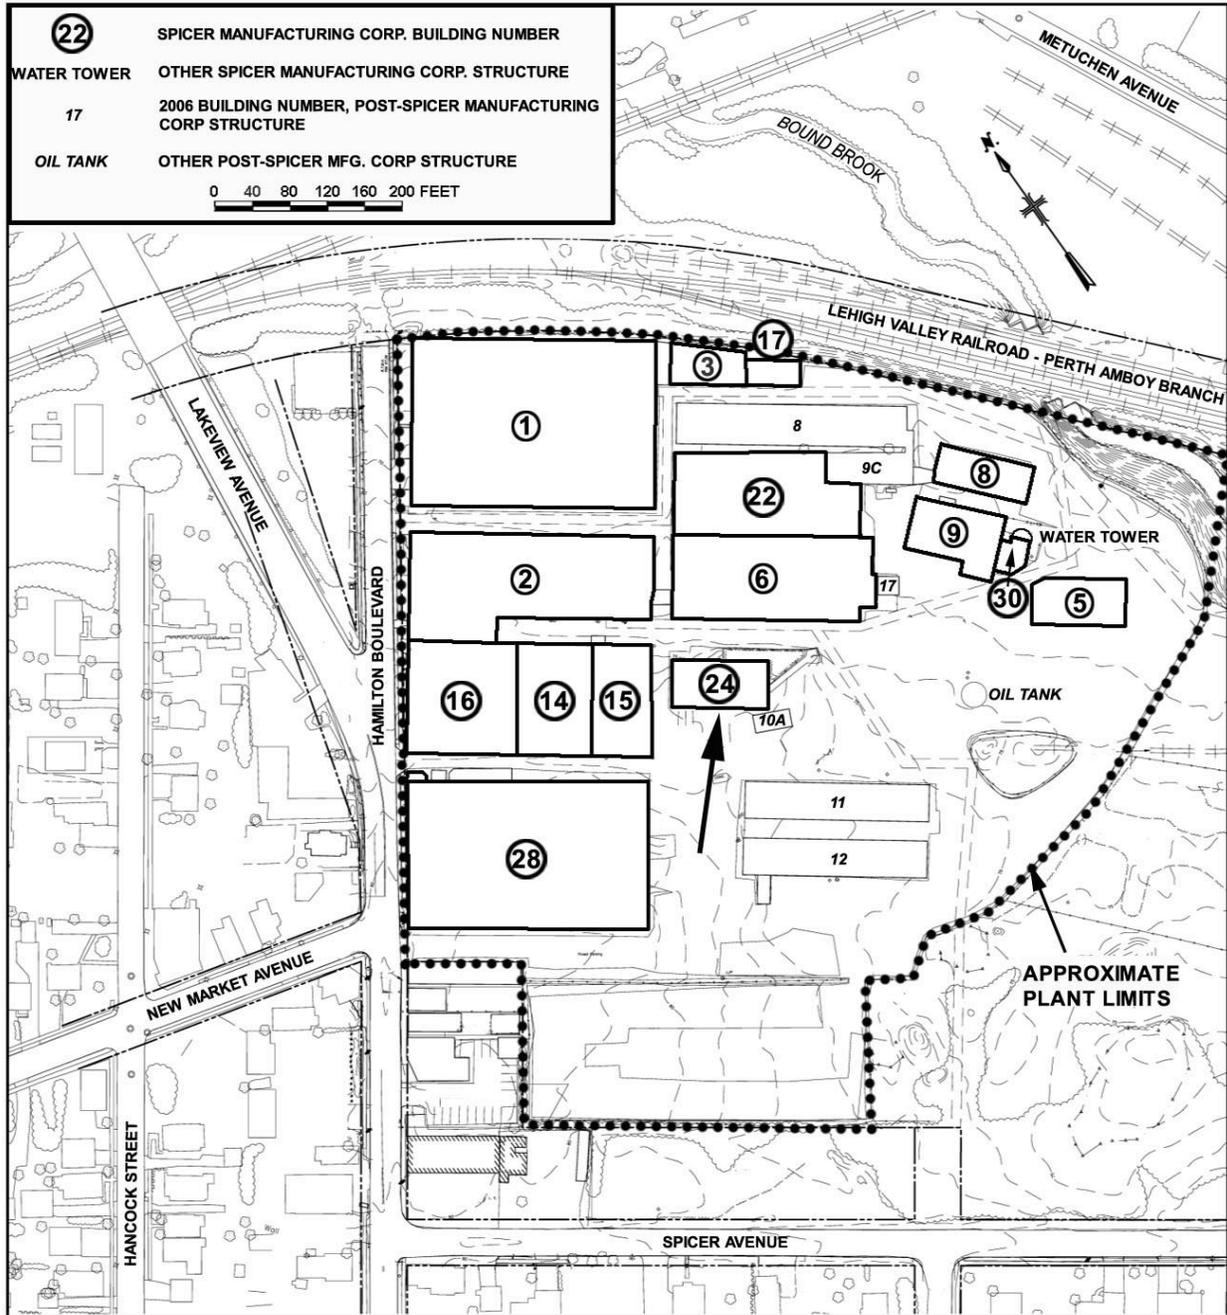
BUILDING 24 LOCATION AT FORMER SPICER MANUFACTURING CORP. PLANT
